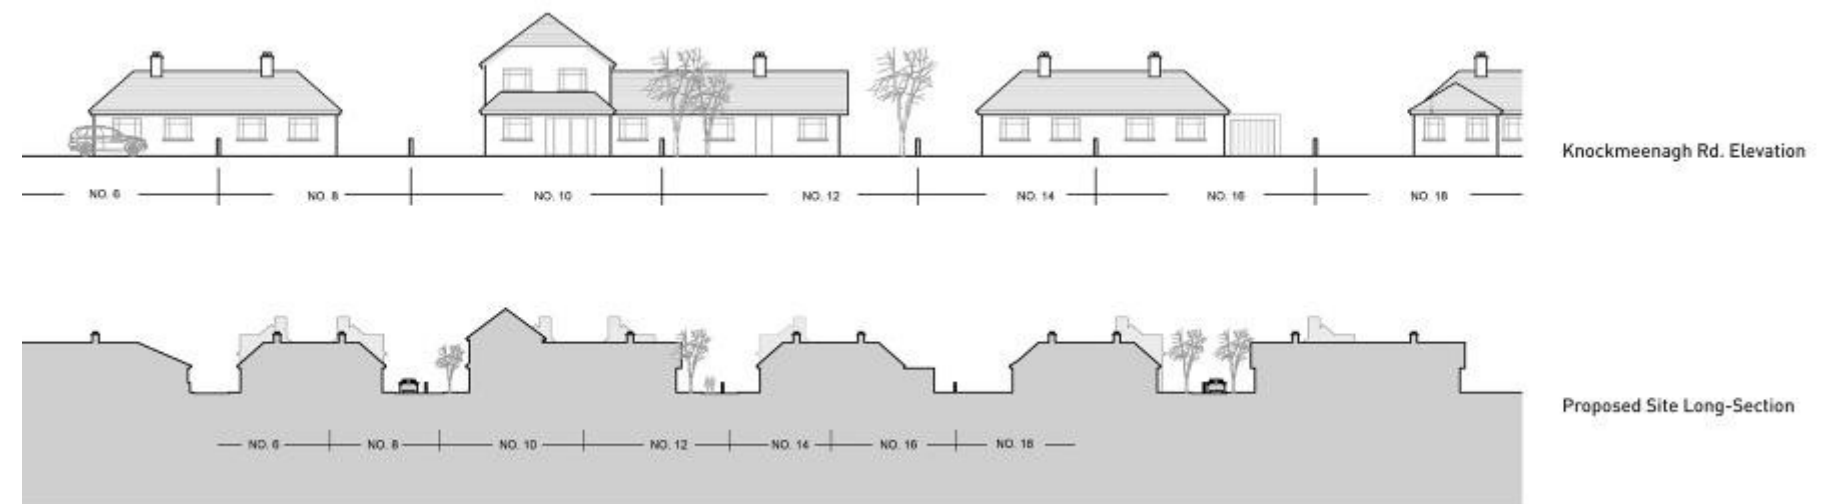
Cross sections of an existing site showing building heights facing onto Knockmeenagh Road, and future profile with two storey development to the rear.
